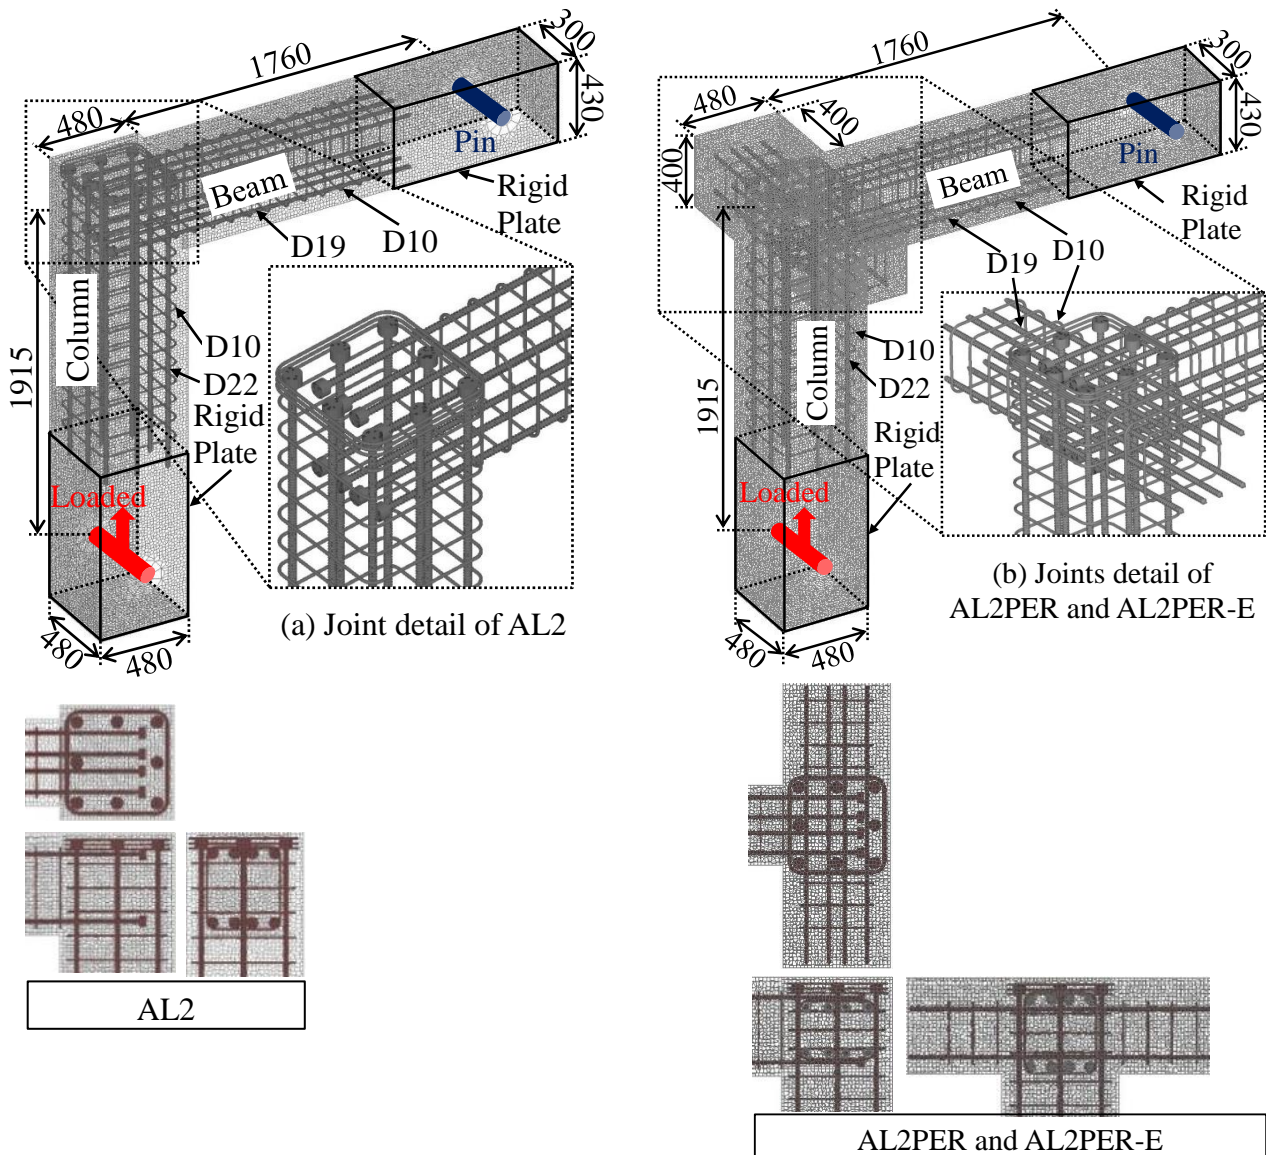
Geometries and boundary conditions of numerical models (unit: mm)
